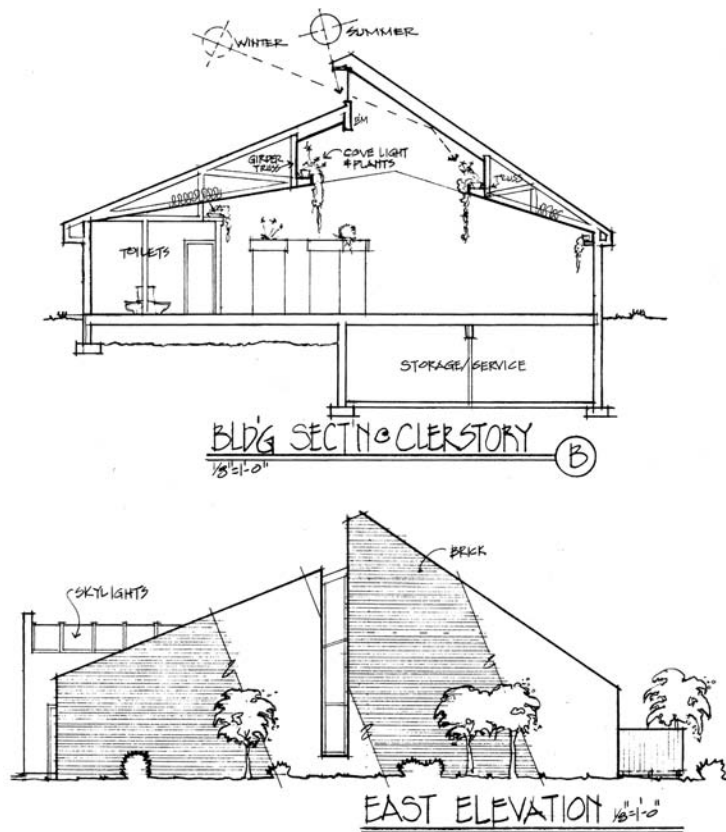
Preliminary building sections and elevations can be sketched to define the verticality of spaces and explore other details.
